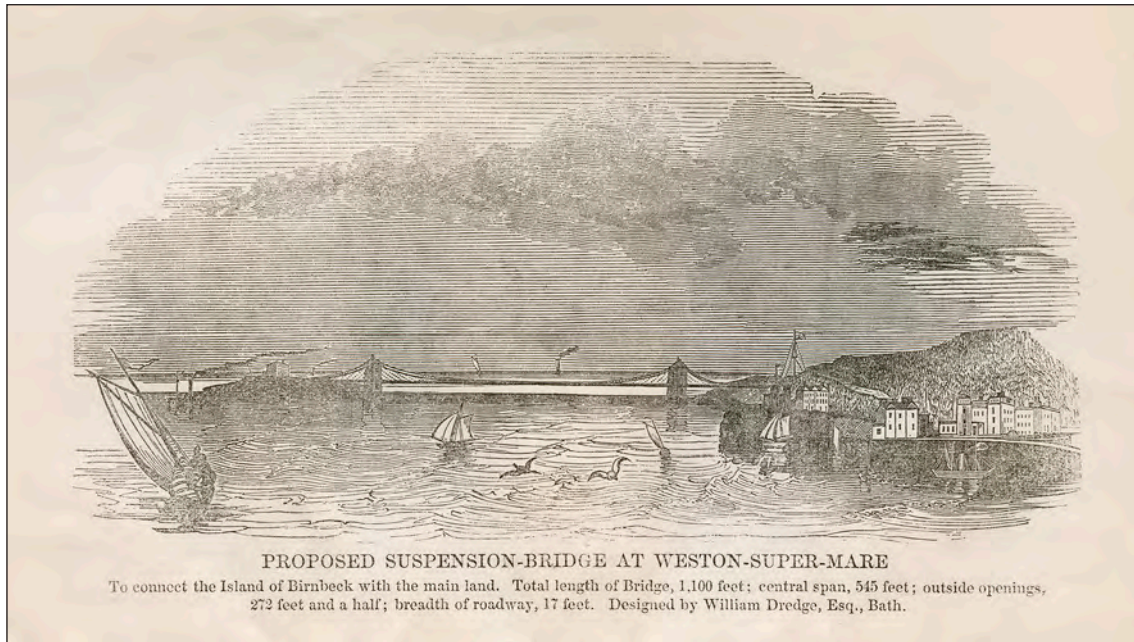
Dredge's Pier was to be 1,100ft (335m) long and carried on substantial, stone piers. This view of 1847 lovingly records the elegant profile of the proposed pier, but shows only a single, small cuboidal block on Birnbeck Island, suggesting that the journey across was initially to be more important than the destination. (North Somerset Library Service)
